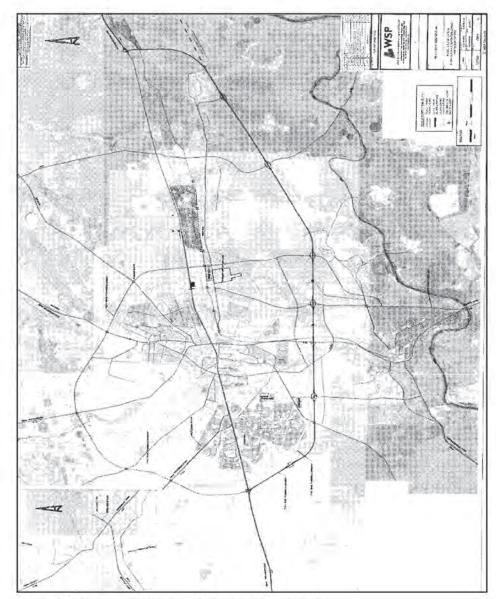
Proposed bypass on N12 around Klerskdorp (Source: WSP Road Master Plan, 2013)
